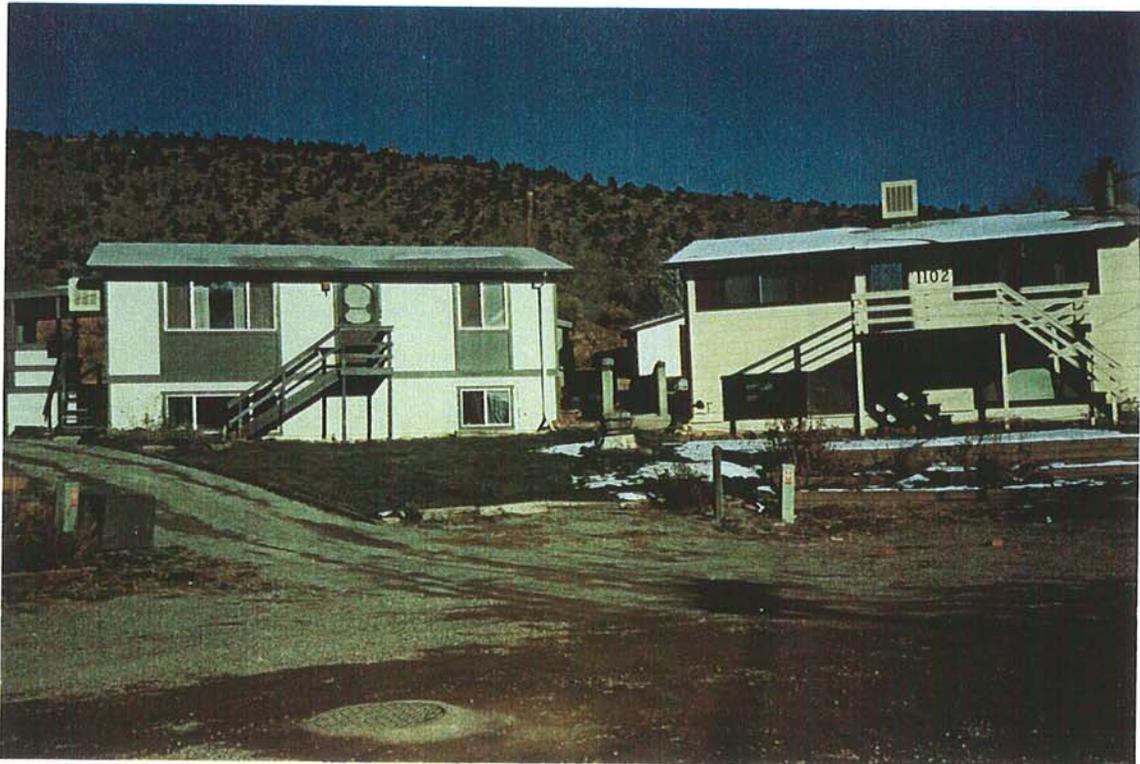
This is the downstream outlet of the culvert shown in Photo 3. Between these two houses is a concrete chute constructed to prevent the flooding which was caused by unplugging the upstream culvert. This chute, however, does not mitigate, and could potentially make worse, flood damage that could occur to downstream properties. A new storm sewer constructed in 4th Avenue could be constructed to convey the discharge from this chute through town.
